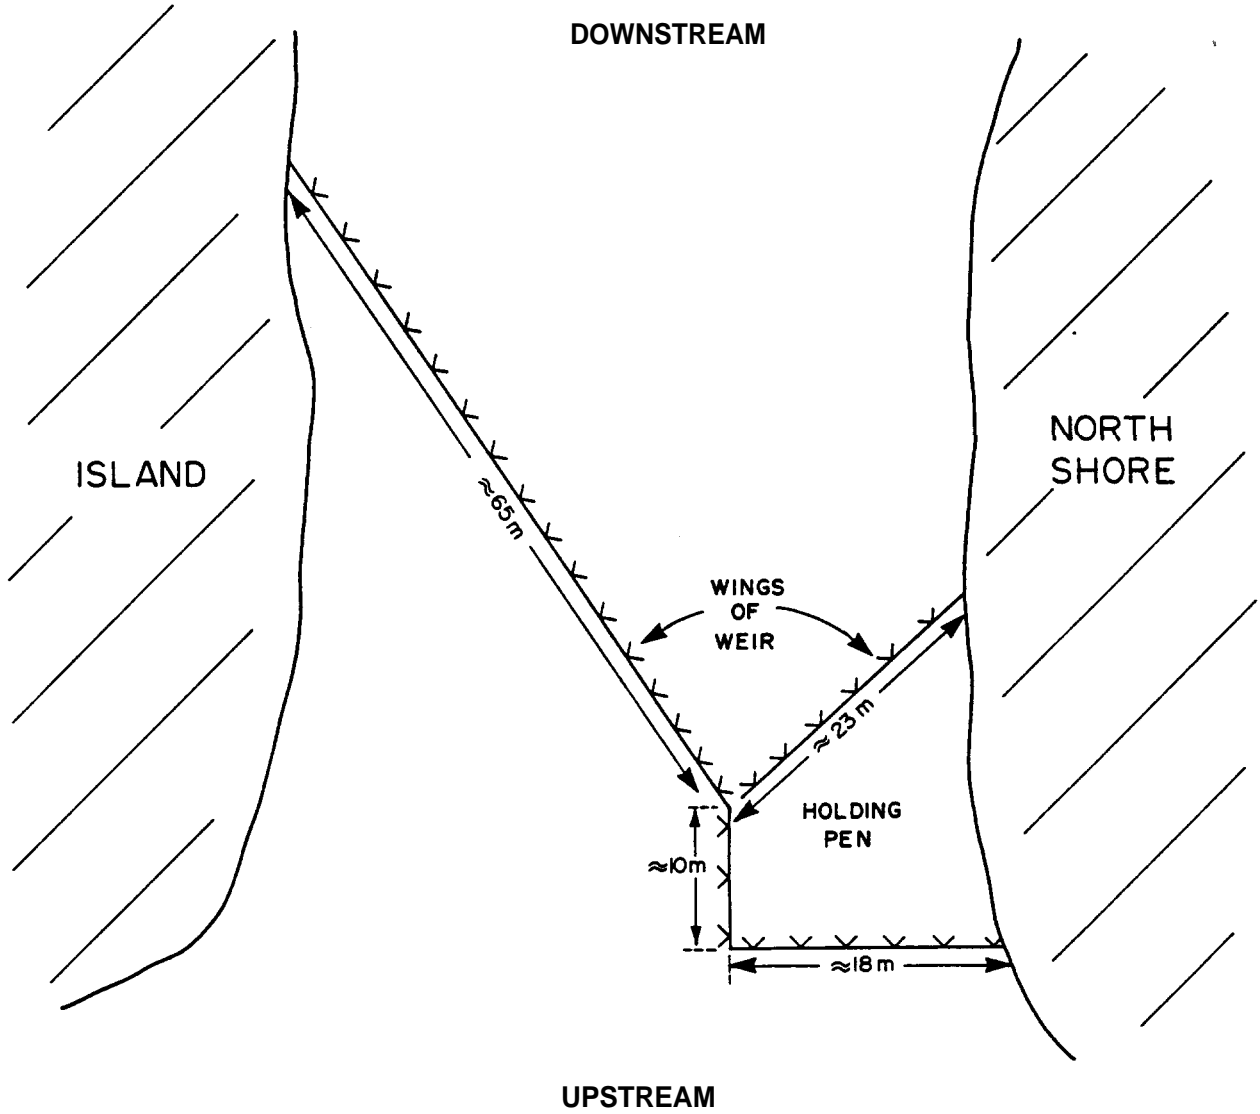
Layout of conduit pipe weir used for commercial fishing in 1982, showing dimensions of structures.
